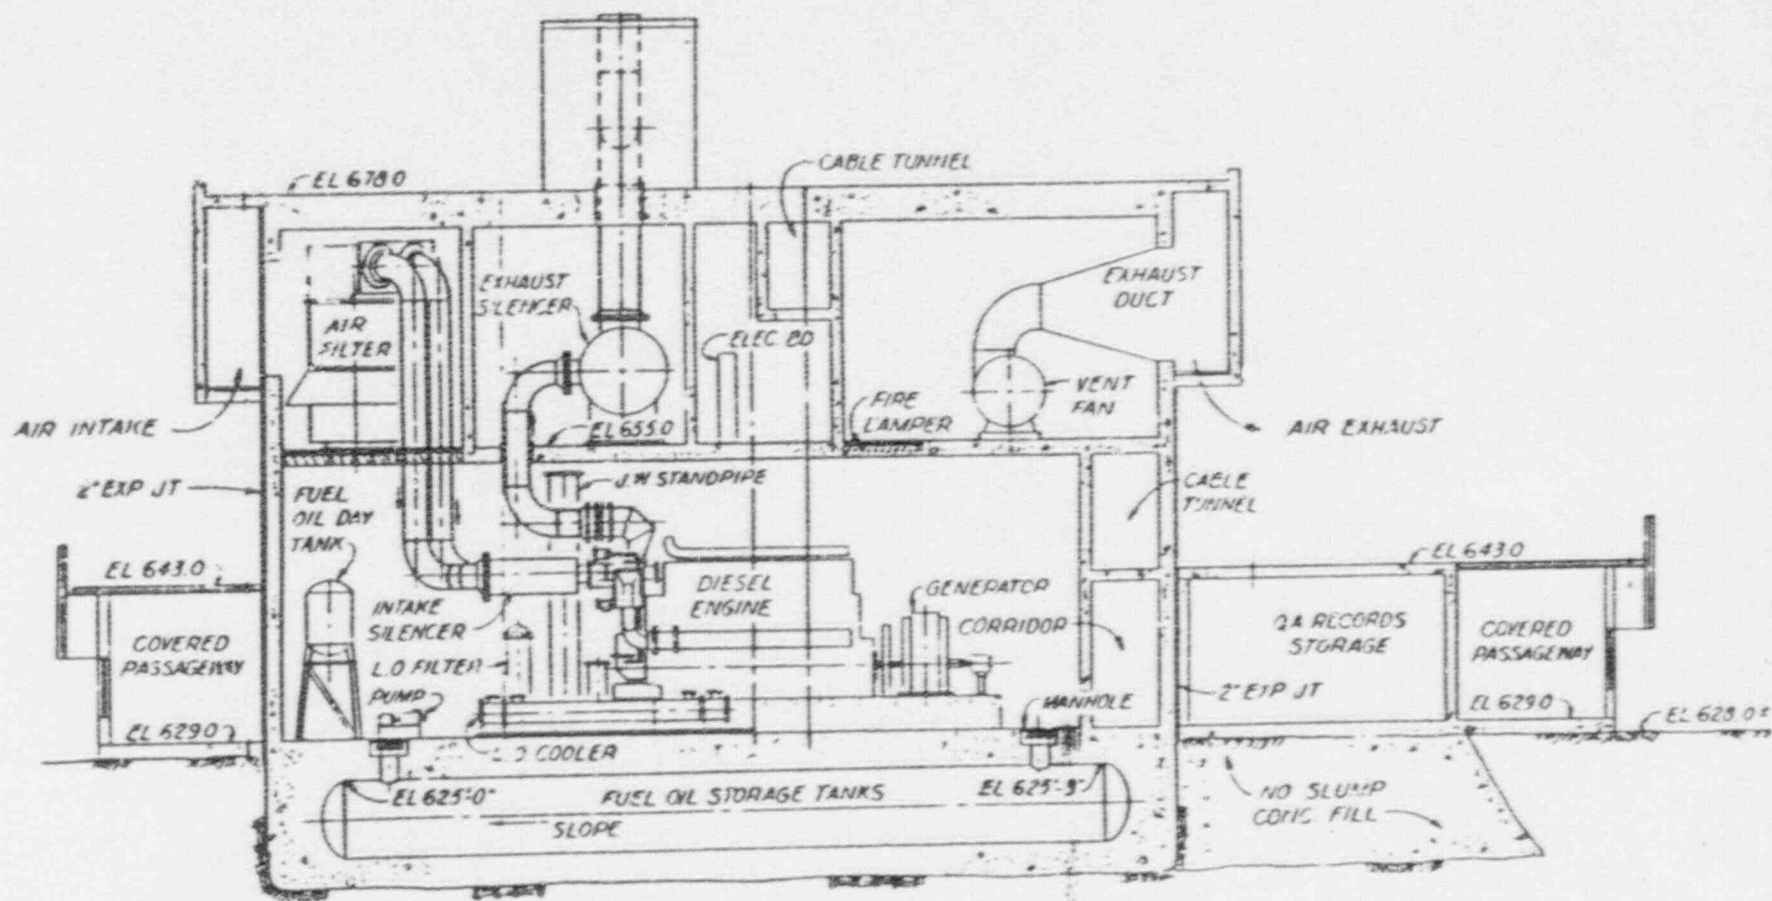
Elevation Views of the Bellefonte Diesel Generator Building (Sheet 1 of 2)
